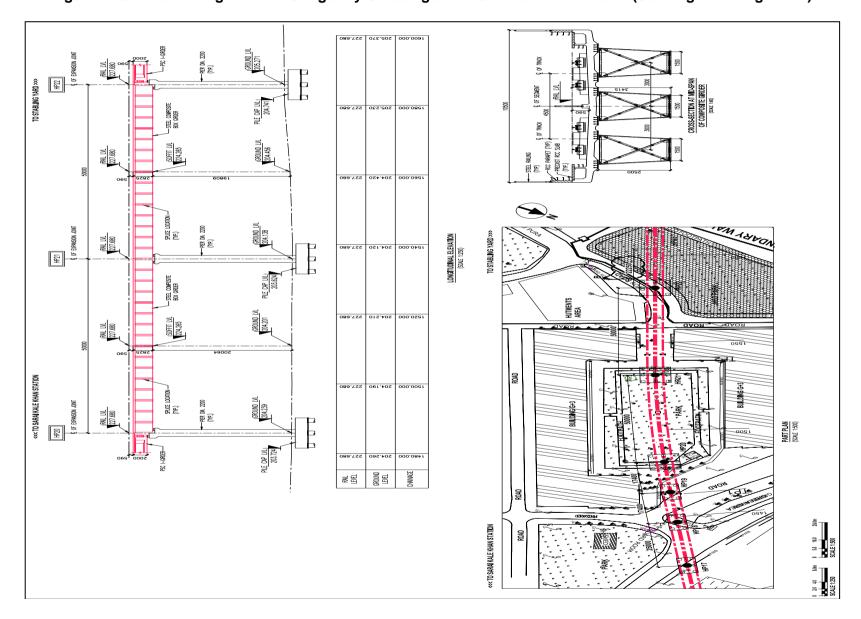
General Arrangement of Obligatory Crossings over Siddhartha Extension (Stabling Yard Alignment)
